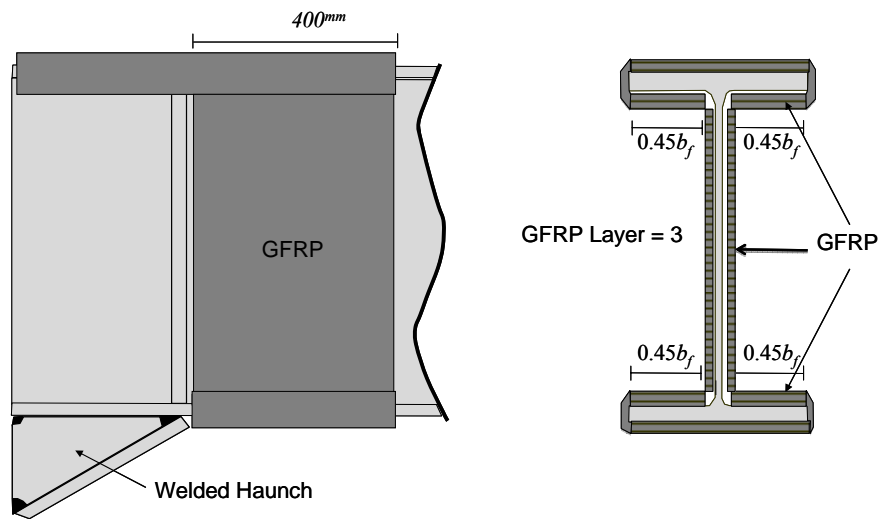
GFRP Layout of HE400AA GFRP1 Beam
